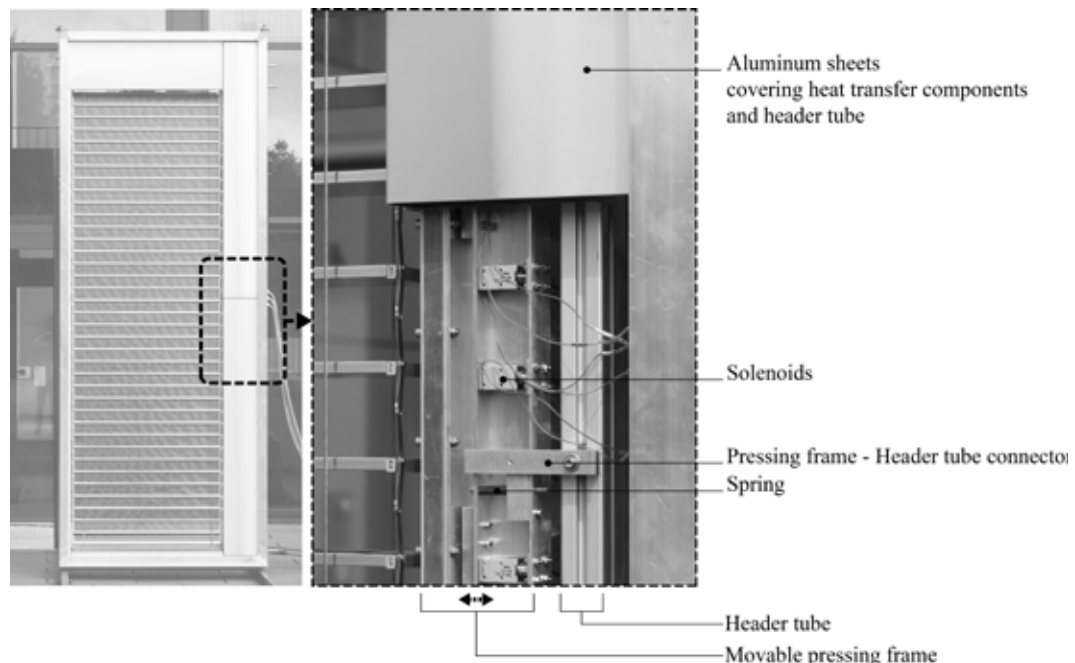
Heat transfer components after assembly. See Fig. 7 for more detail (cross section) © Fraunhofer ISE and Priedemann Facade-Lab
